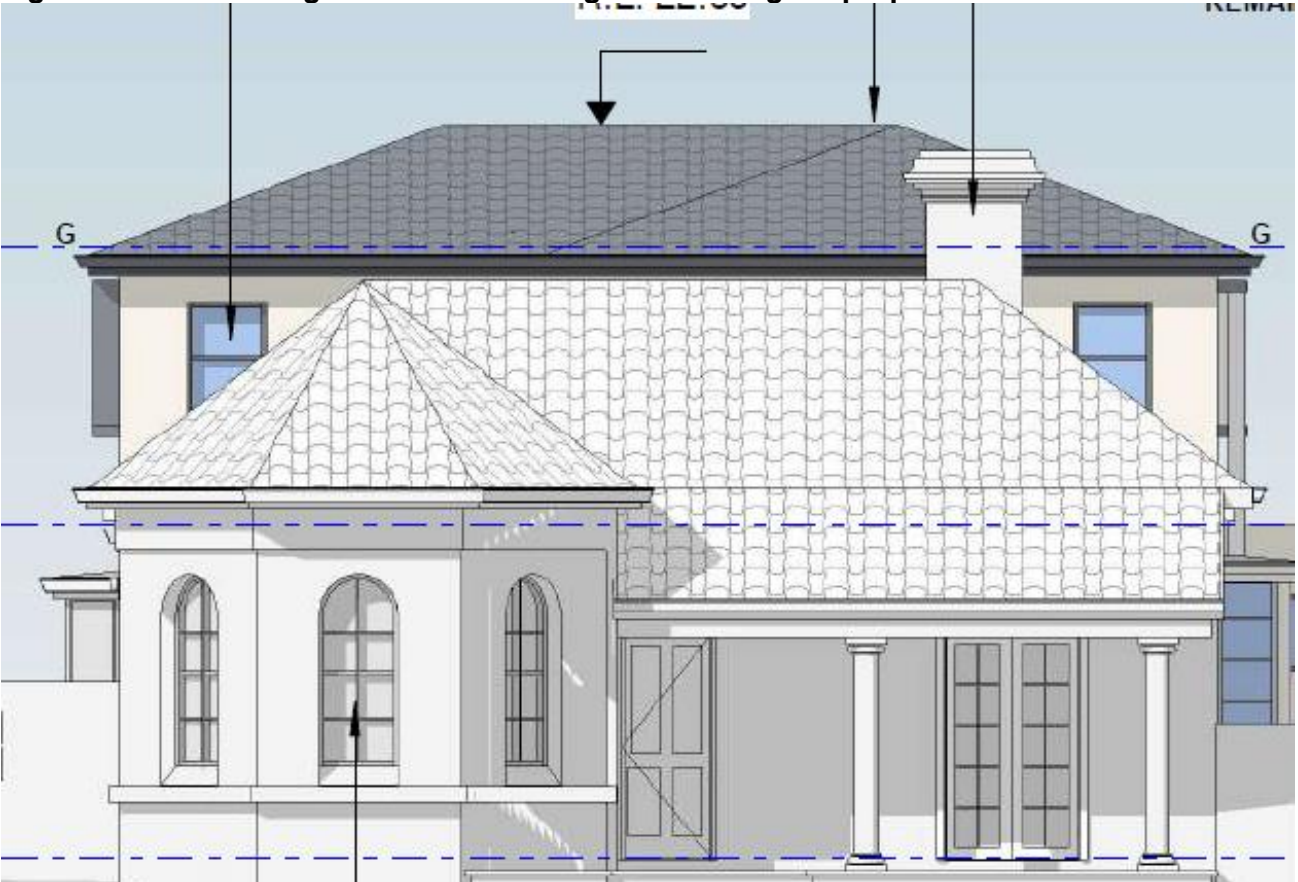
The existing residential dwelling with the proposed rear addition (as amended)
